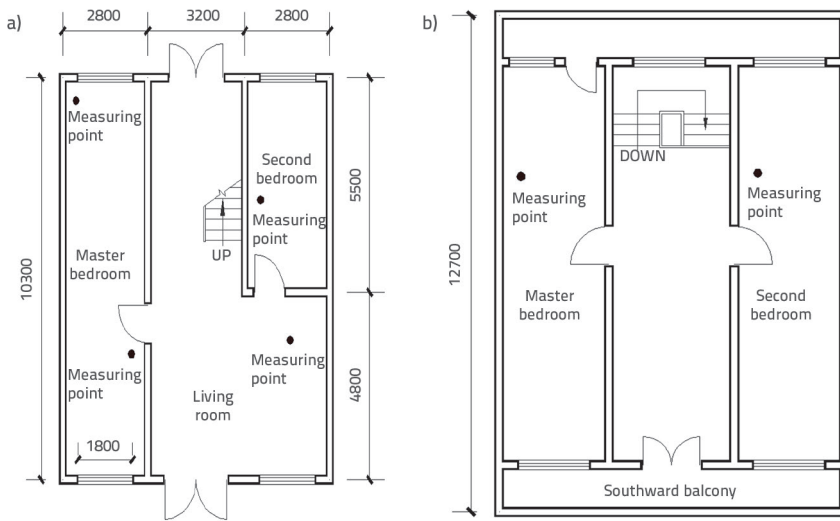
Original space division scheme [mm]: a) Spatial division of first floor; b) Spatial division of second floor
